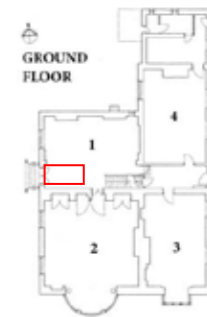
Entrance Hall showing new partition wall and area of rot to timber on lower left side
